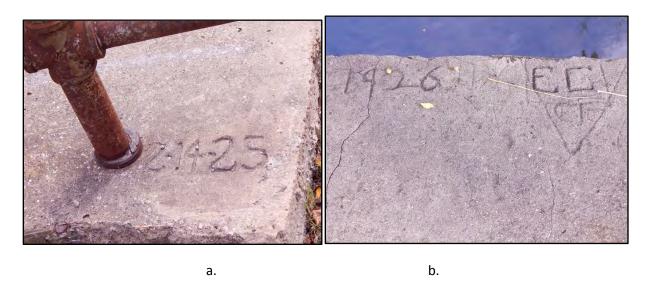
Construction date of Salinas Street Bridge and date of cement cap on nearby west wall.
